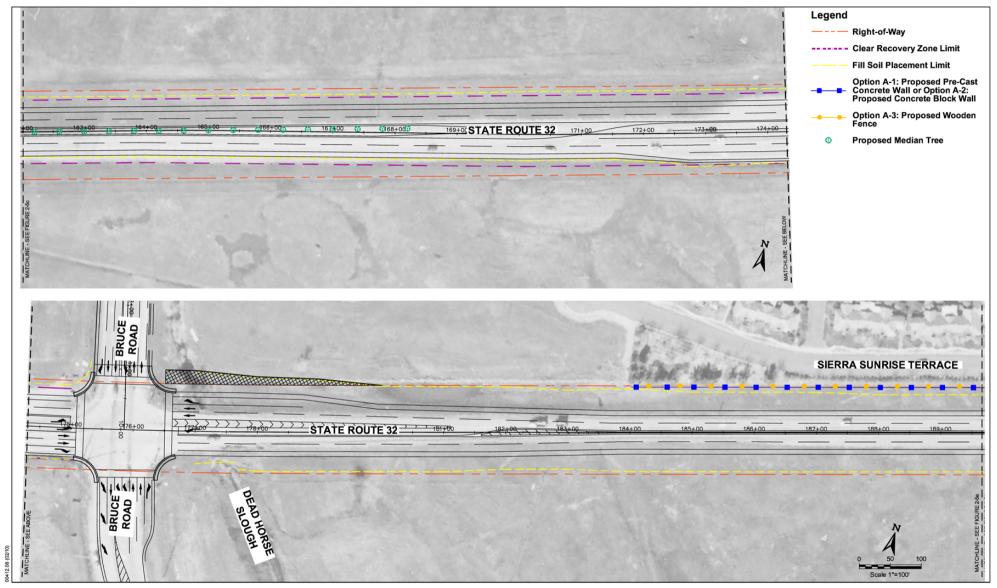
Timber Barrier Alternative, including Proposed Sound Barrier
